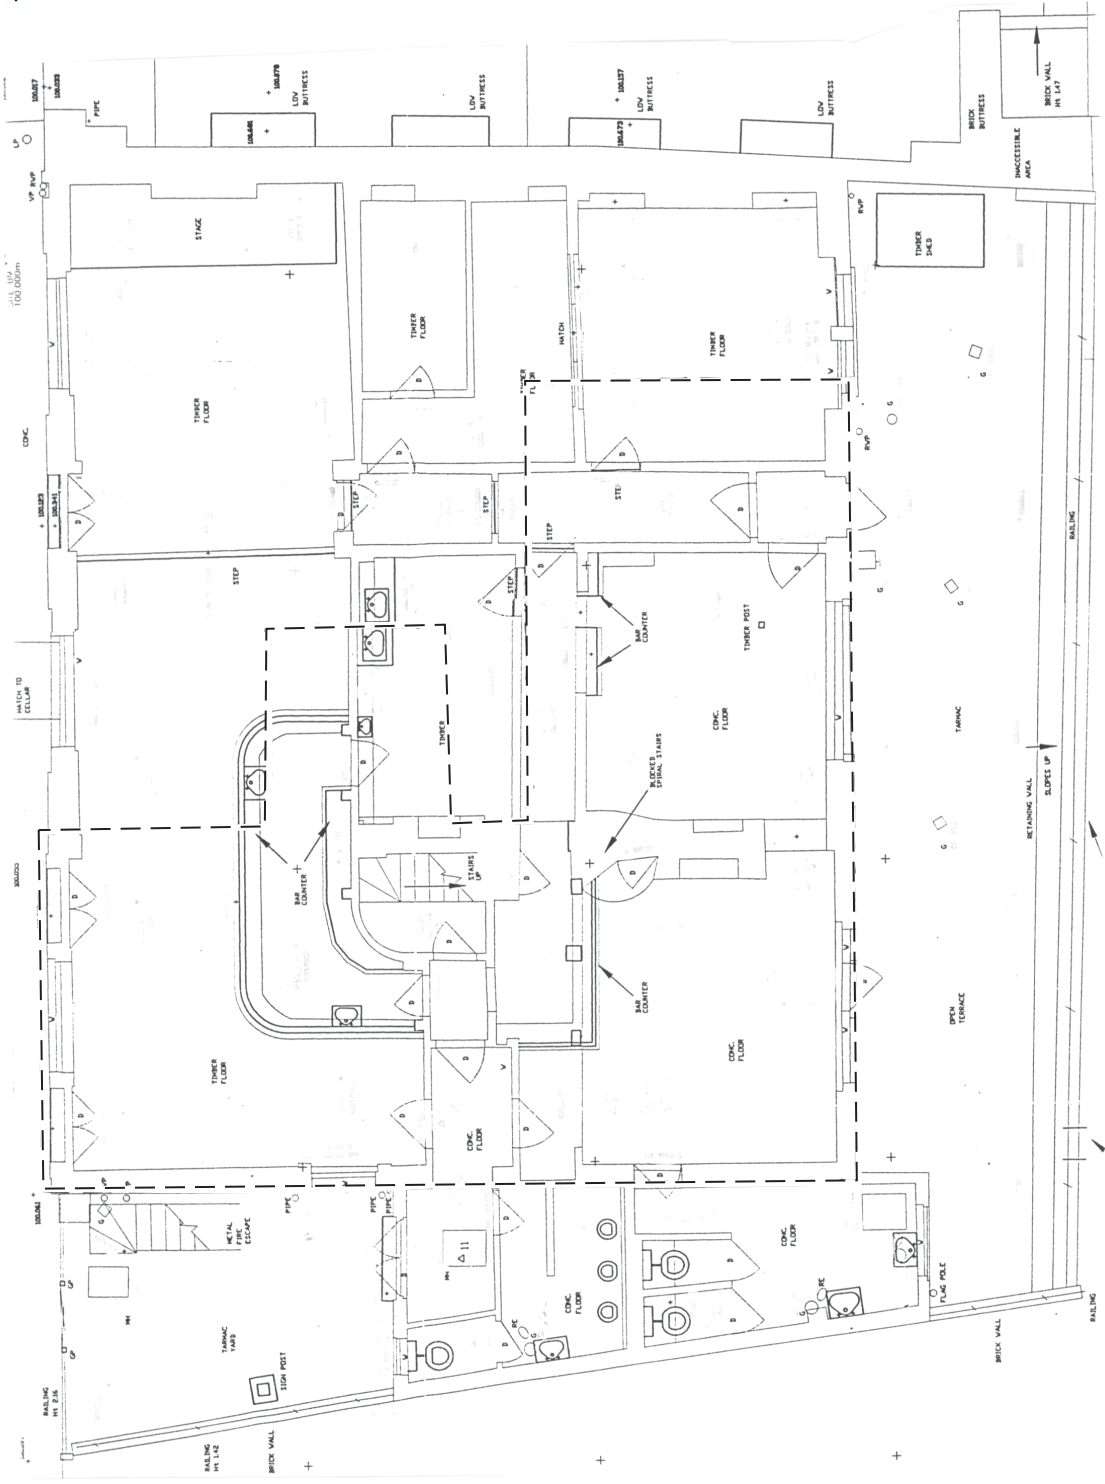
Plan of the ground floor of The Gun with a plan of the first floor superimposed in dashed outline
